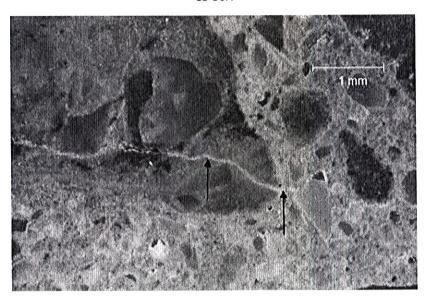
Photo 8 (see Appendix E page 165) Expansive ASR crack in core C5
